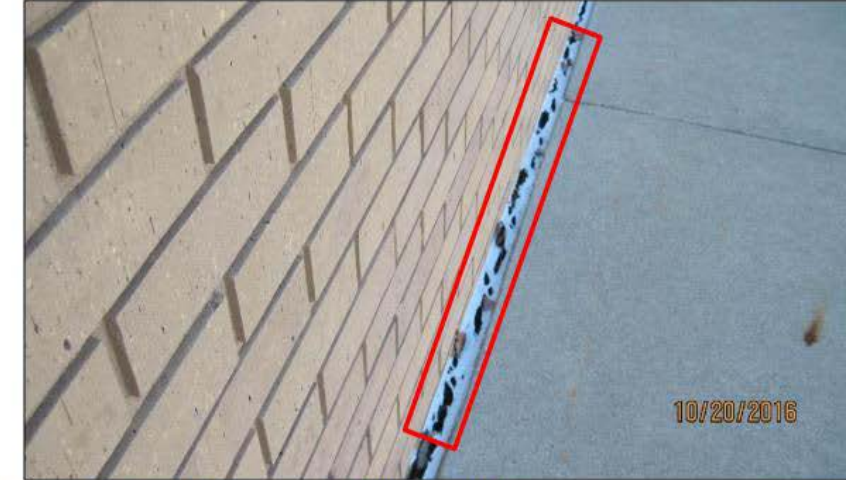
Failed poured concrete to masonry joint, area outlined in red.
